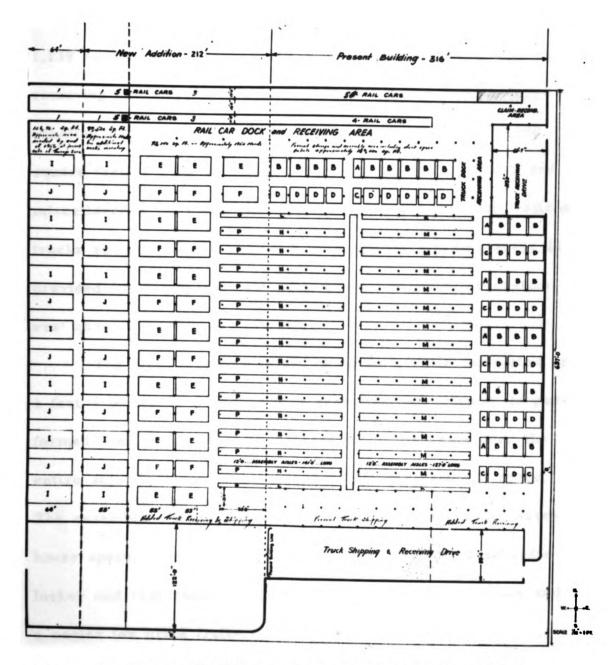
Present building and proposed expansion of the Jewel Tea Company, Incorporated.
